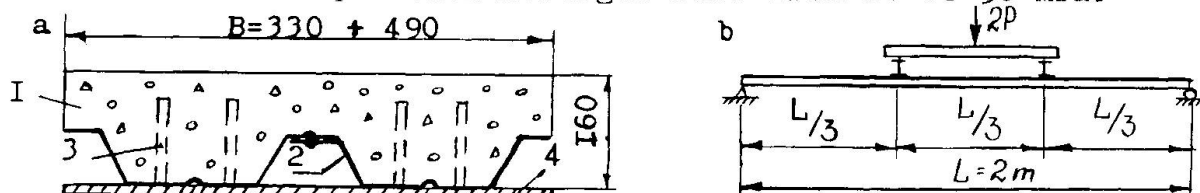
Support section of slab specimens (a) and test load arrangement (b) : 1 - concrete; 2 - reinforced profile; 3 - anchor studs; 4 - support plate.
